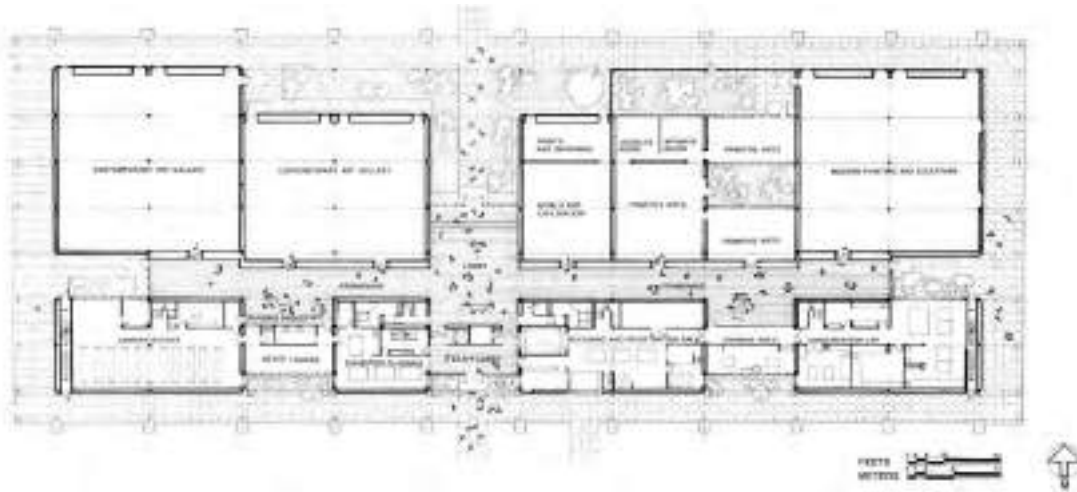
Menil Collection’s ground floor plan (Renzo Piano Foundation, Genoa).
